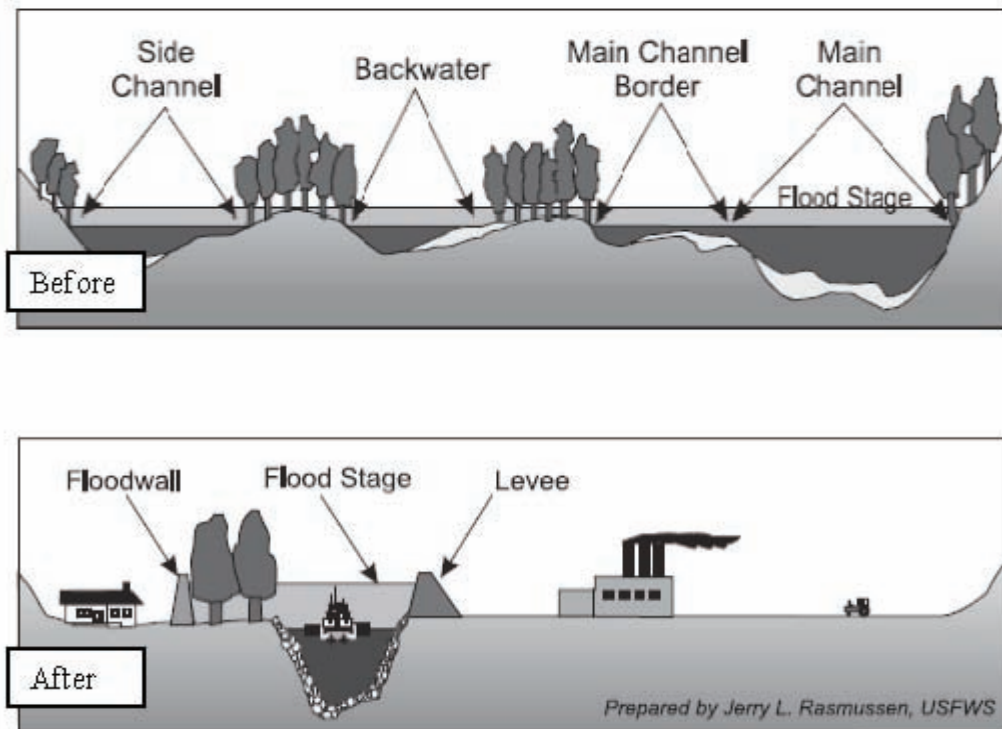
Typical cross section before and after the Missouri River bank stabilization and navigation project (Cardno Entrix, Inc, 2011).
